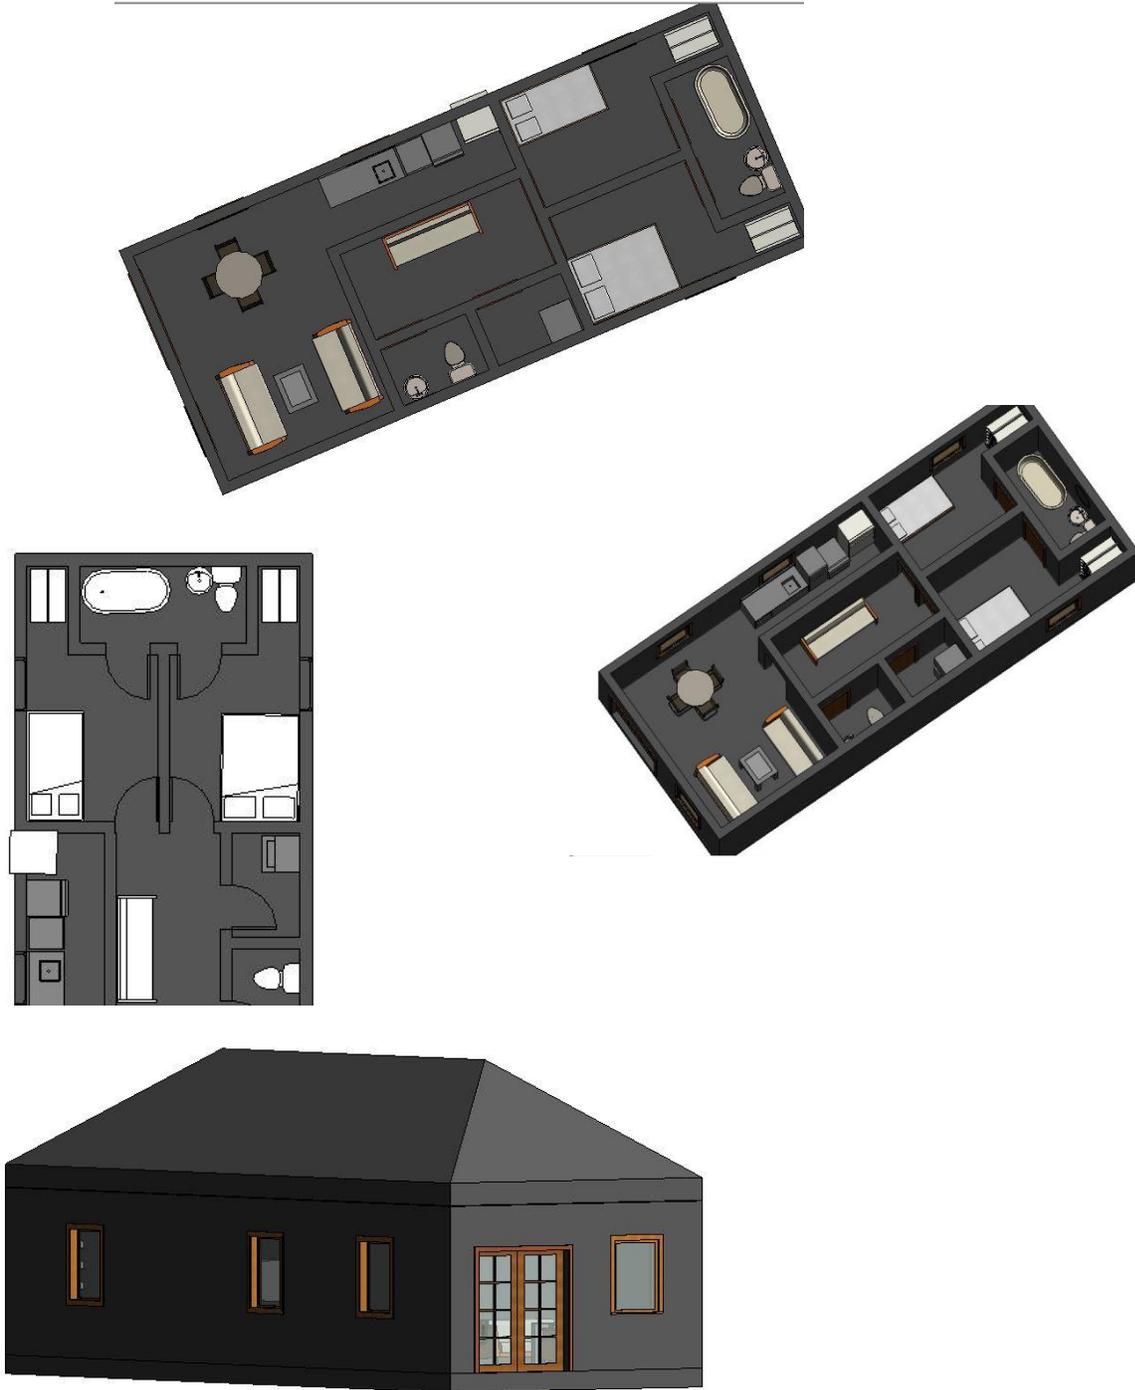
3D drawing scoring a 1-2 on Tiny House Rubric
